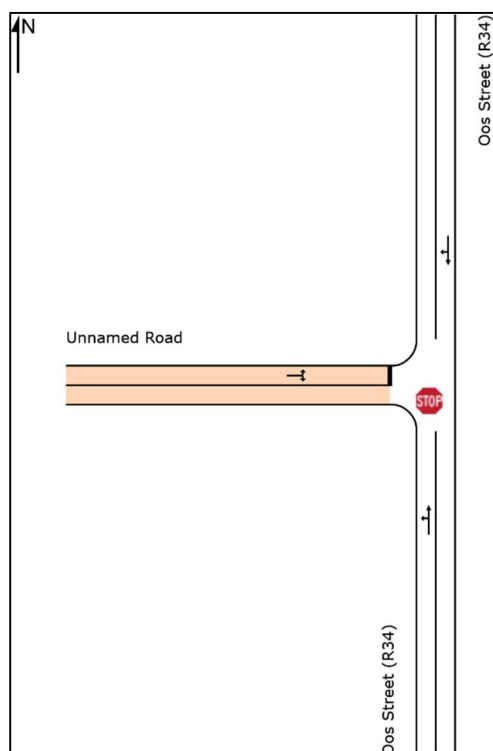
Oos Street (R34) and Unnamed Road - Existing Layout
